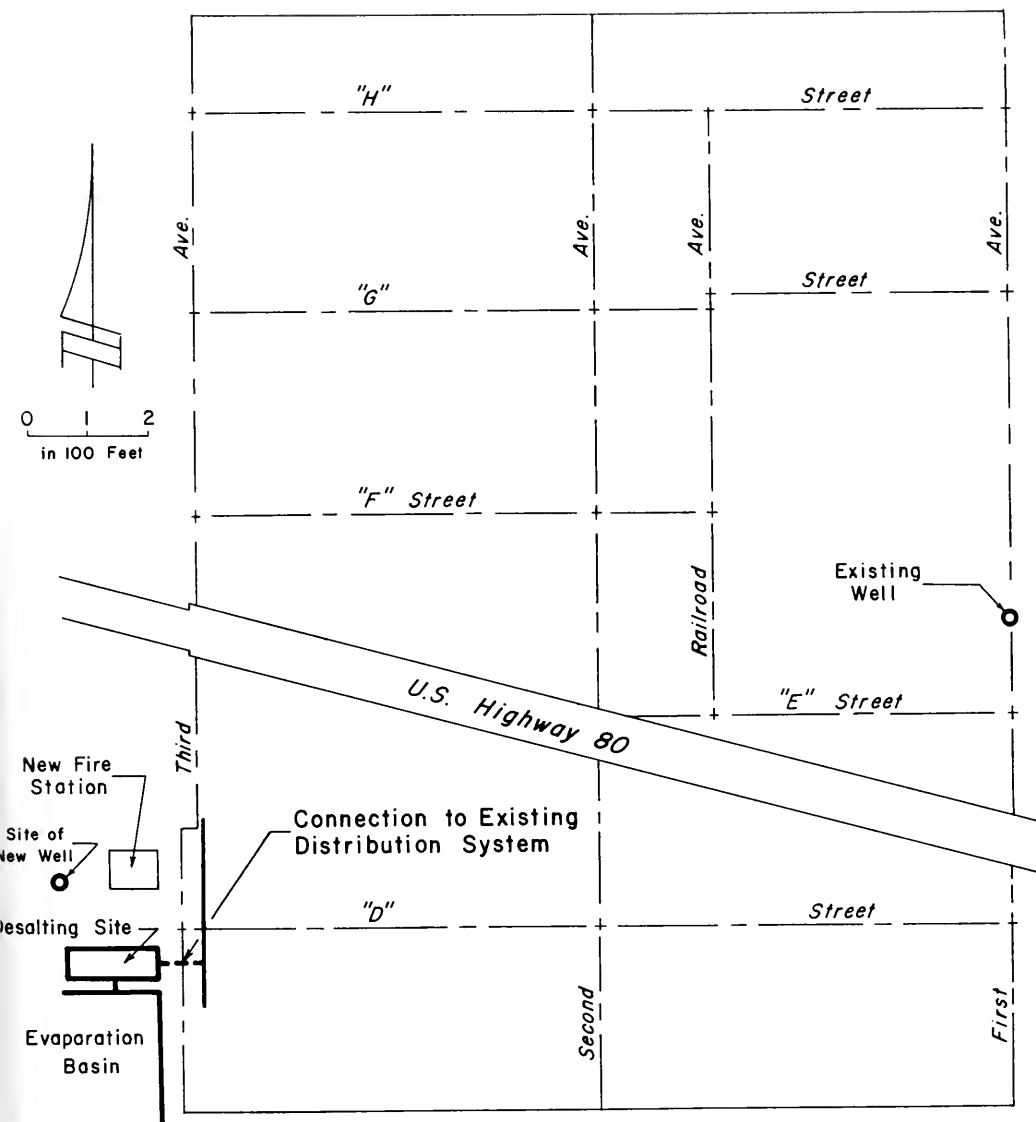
Location of Proposed Desalting Facilities at Winterhoven
